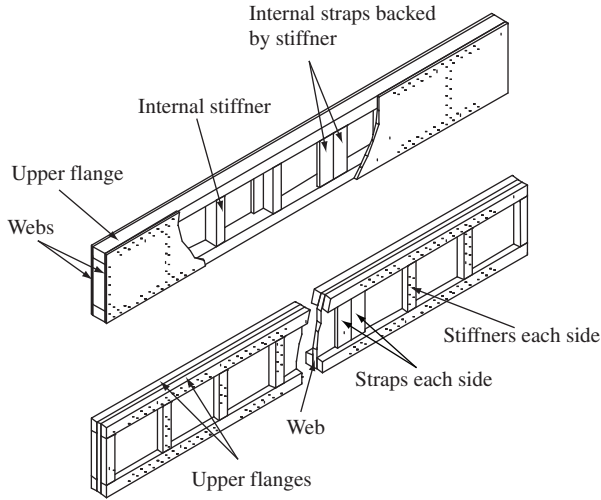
Scheme of Plywood timber beams with box and “I” section.
